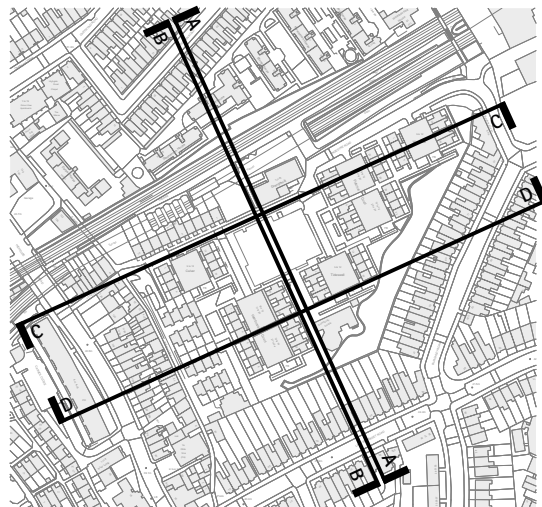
Sections of the Proposed Development and Adjacent Townscape
